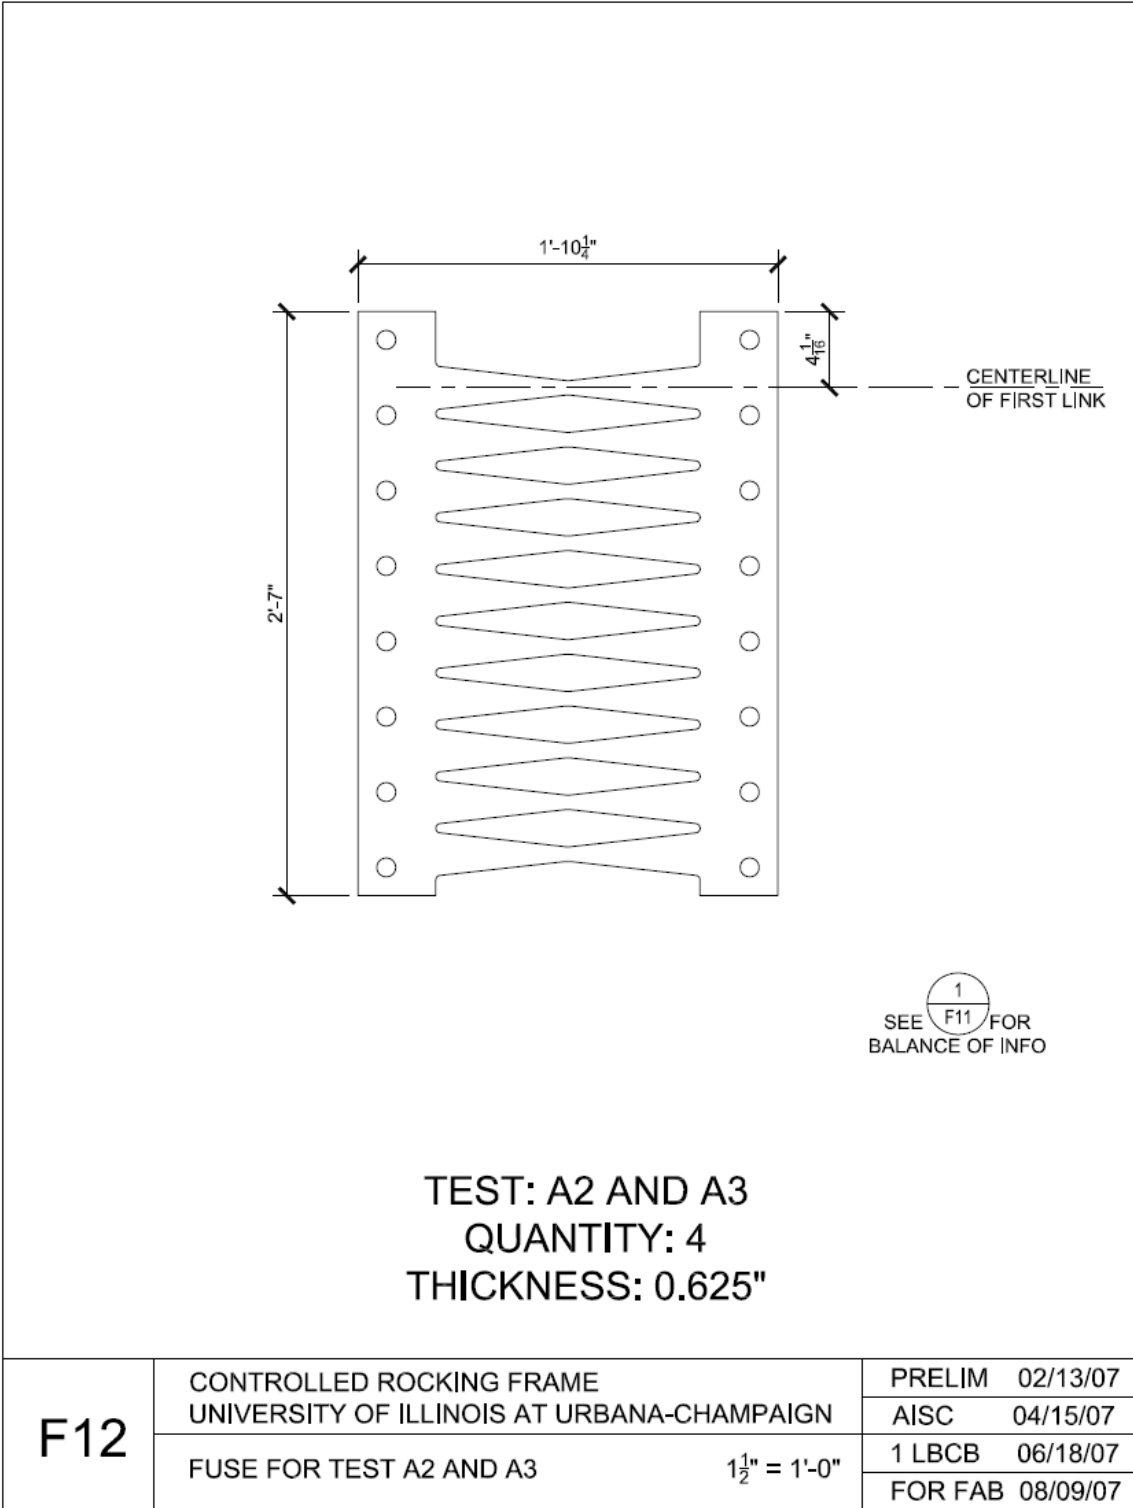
Specimen Design Drawing – Fuse for Test A2 and A3
